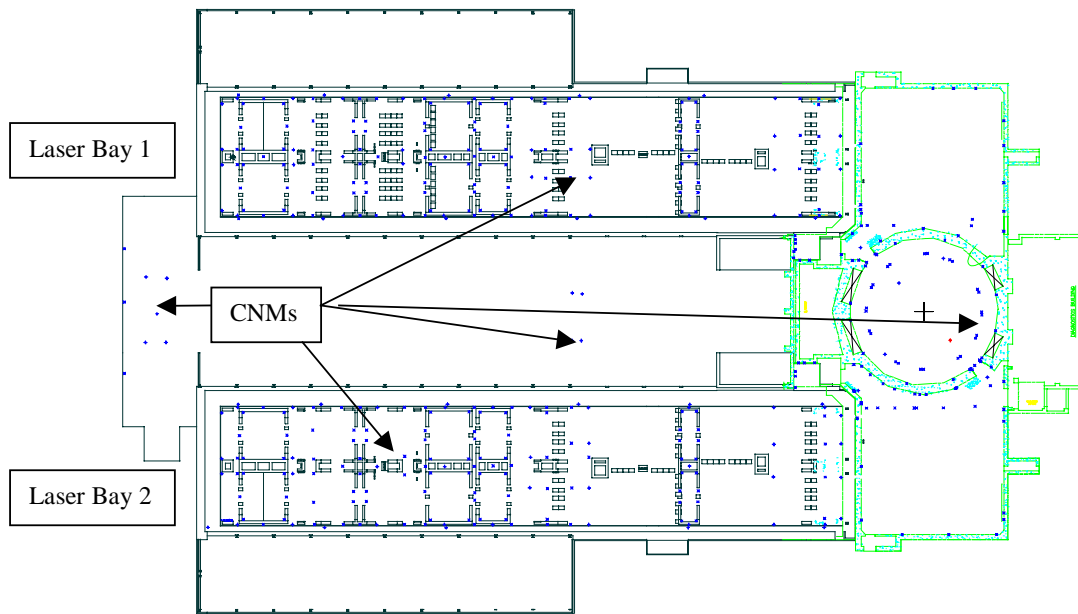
Layout of CNMs on the 0.0ft elevation (Level 3)
